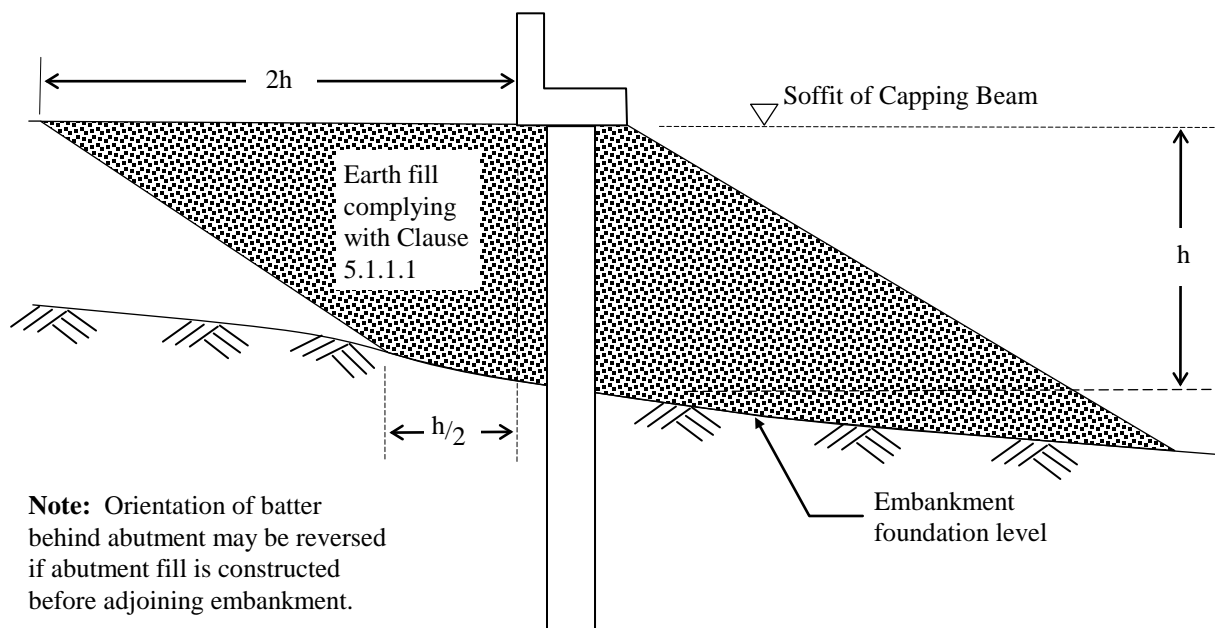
Dimensions of Fill at “Spill-Through” Bridge Abutments
